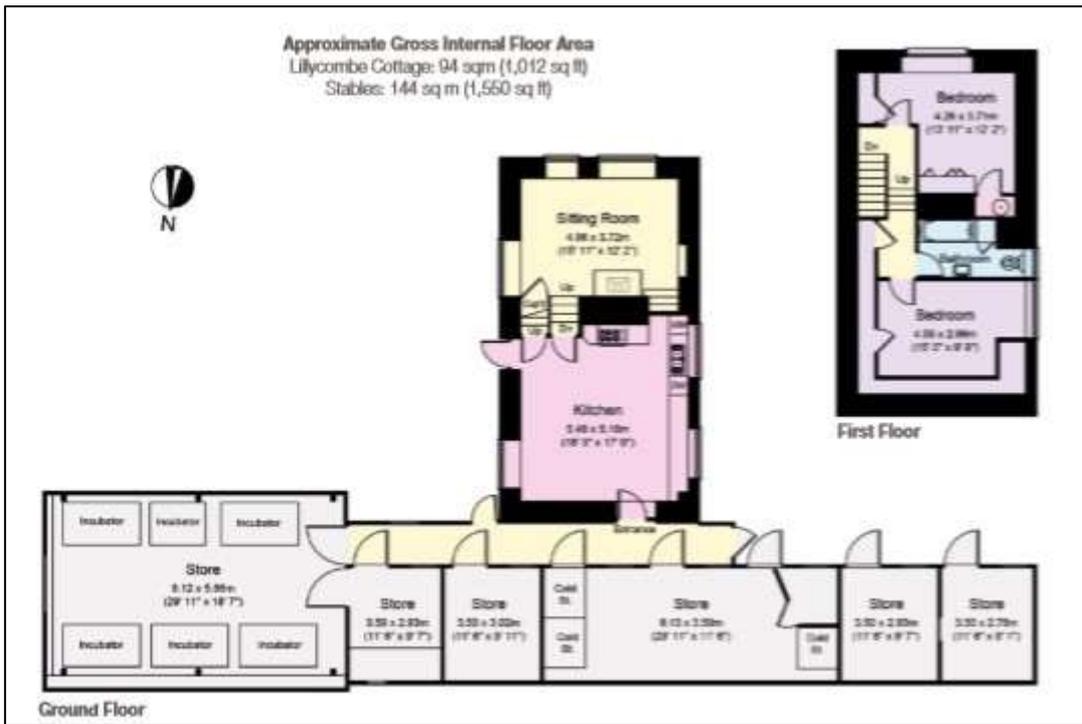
STABLES COTTAGE AND STABLES PLAN FROM THE KNIGHT FRANK SALES DETAILS.
